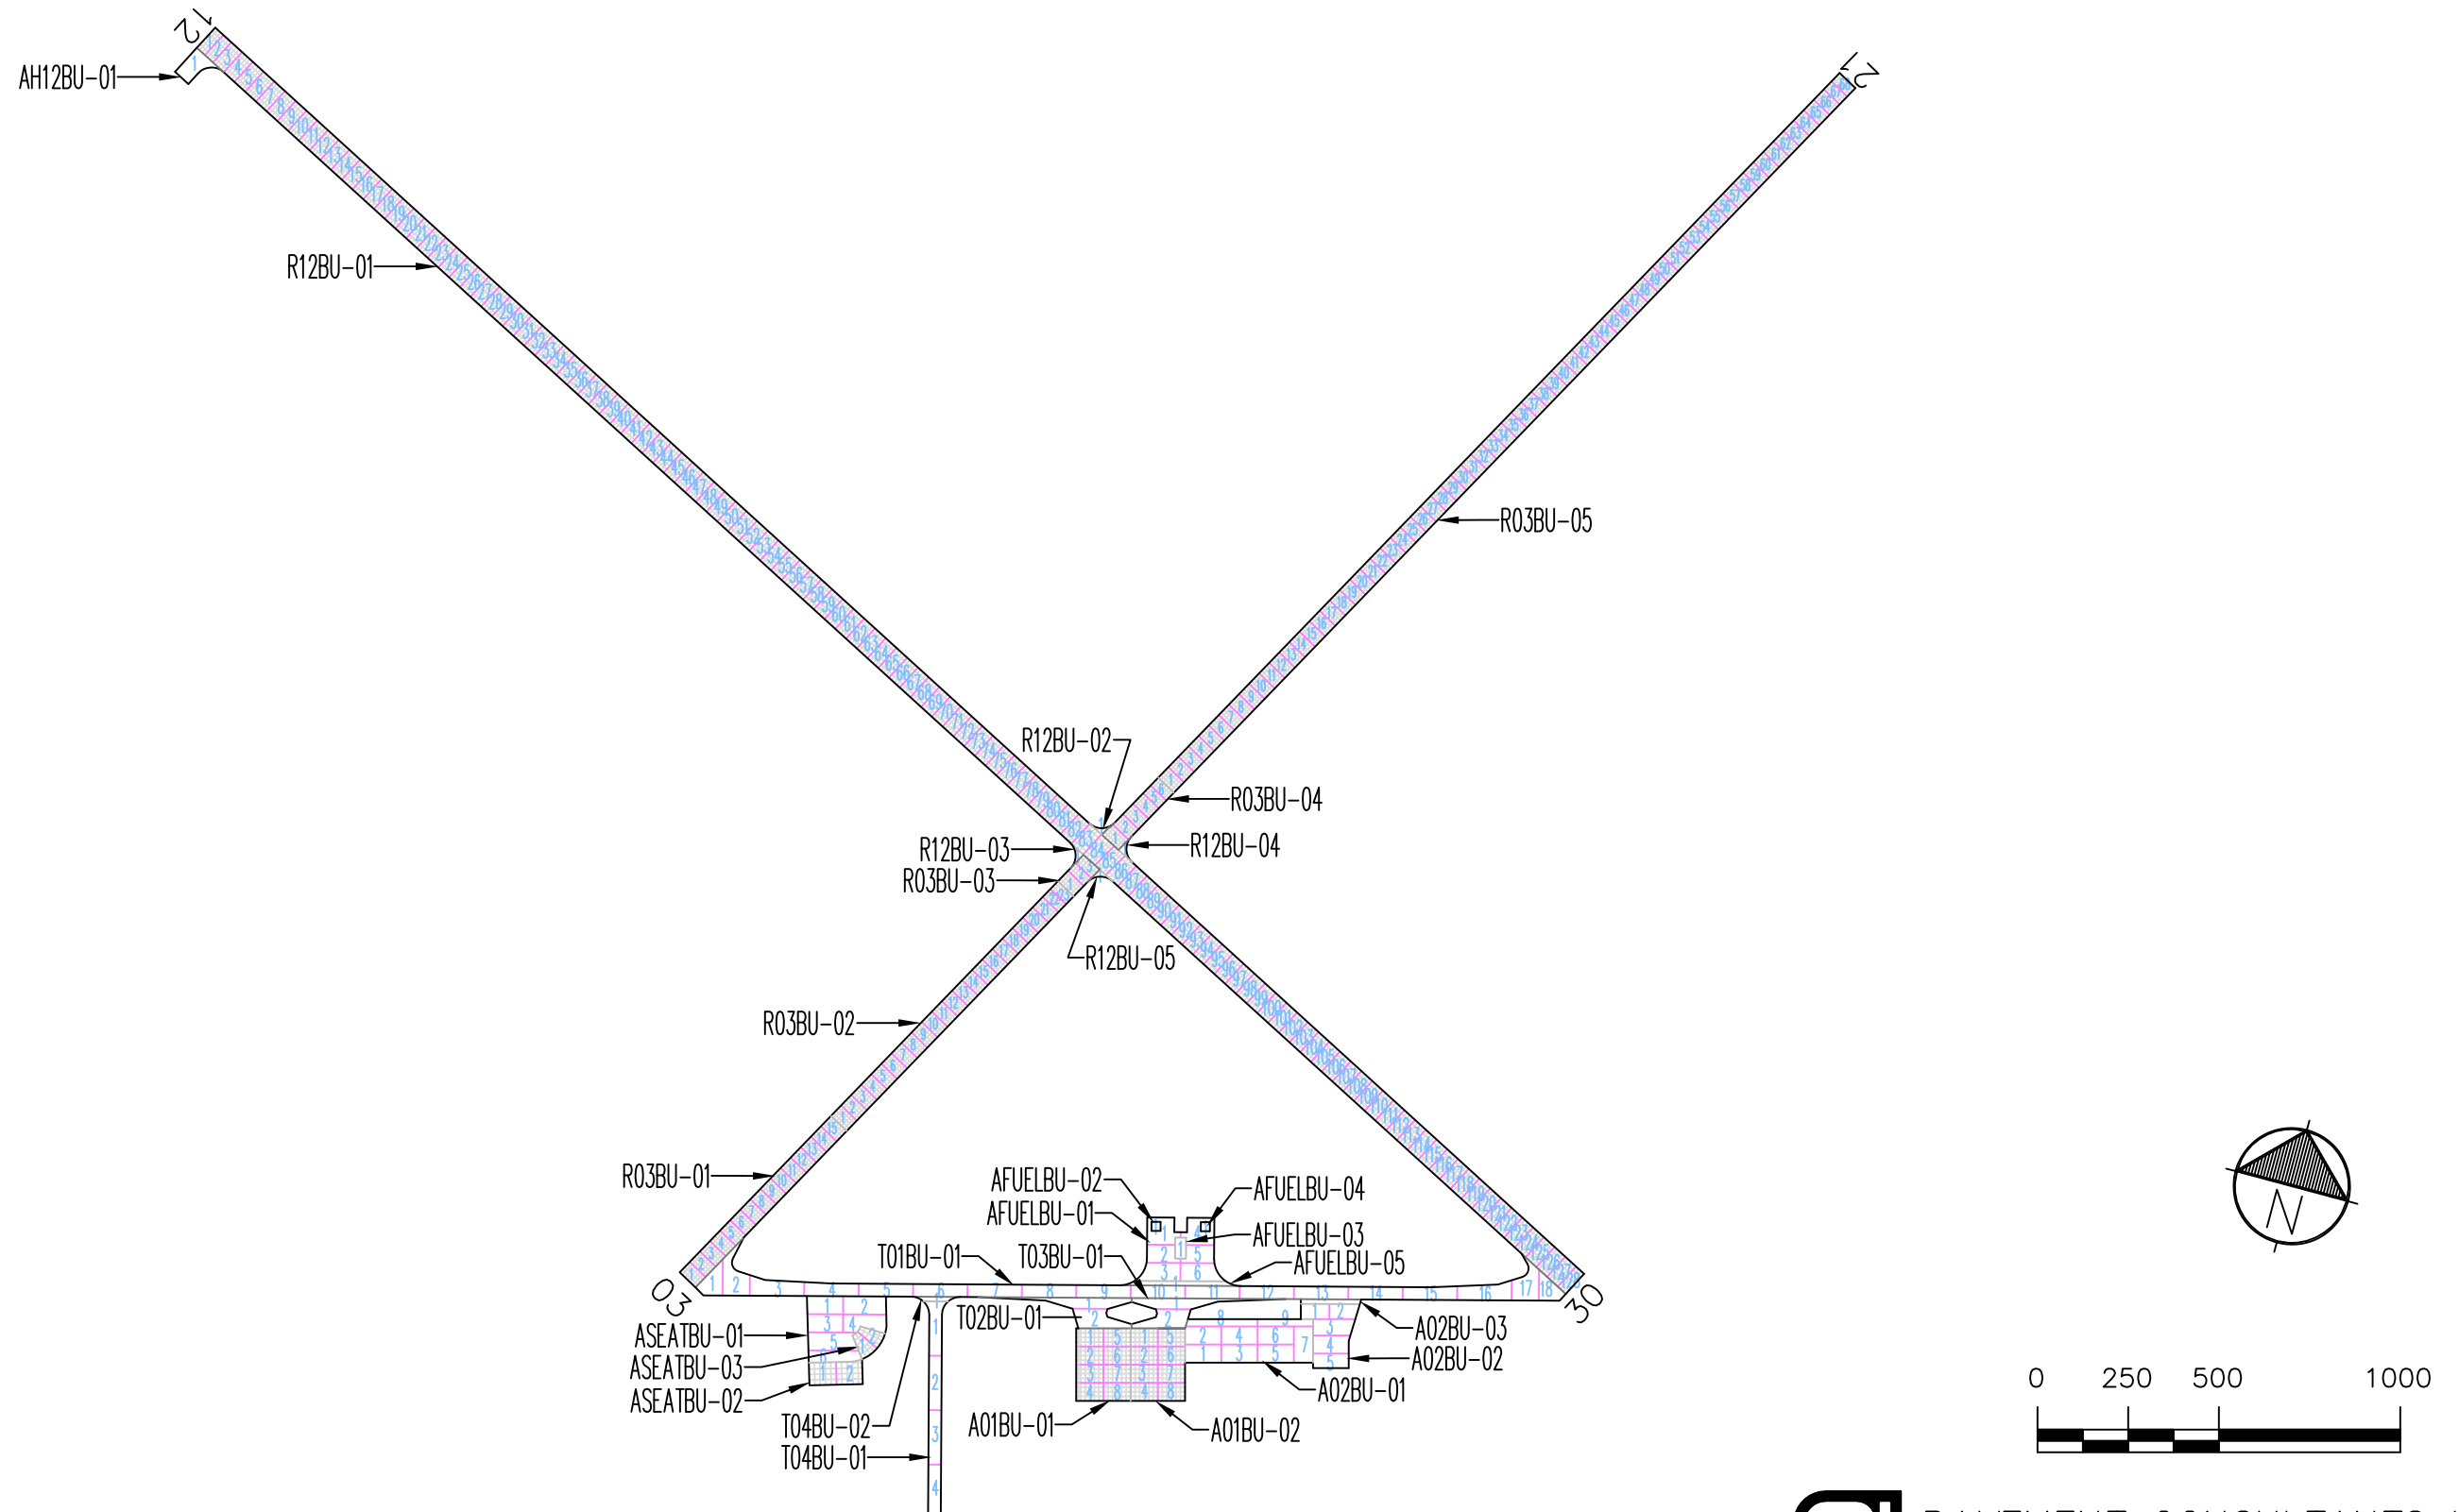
Pavement Branch, Section and Sample Unit Layout.
